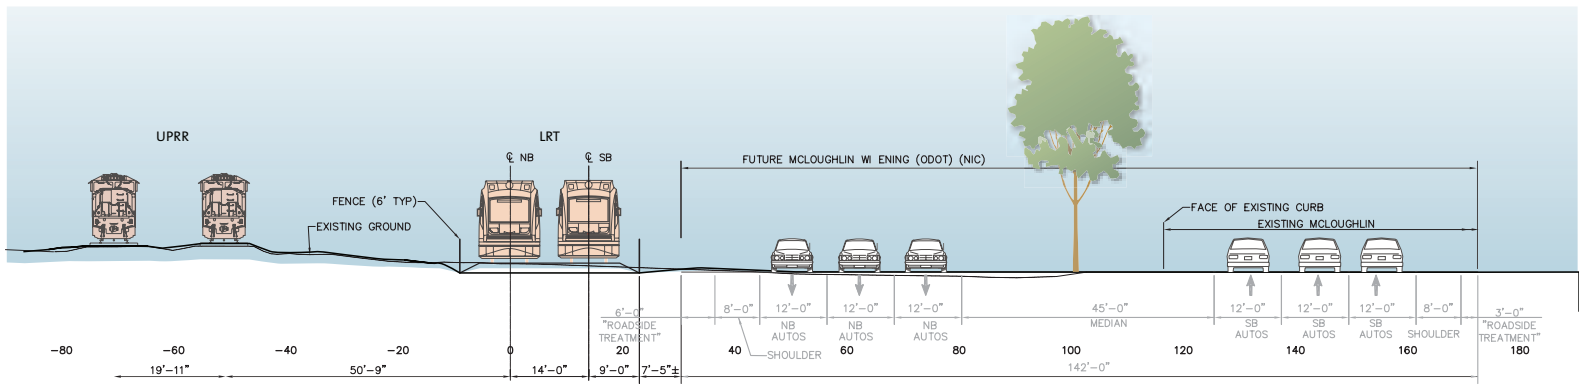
Cross section of light rail alignment and future proposed widening of SE McLoughlin Boulevard
